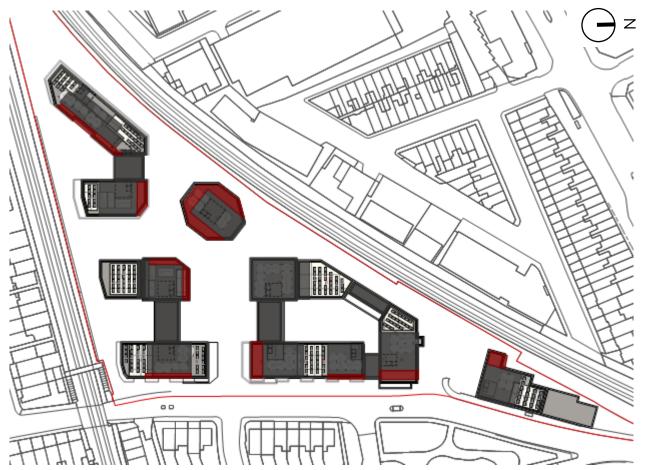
Roof plan demonstrating potential roof area for PV, plant, green/brown roofs and amenity space.
